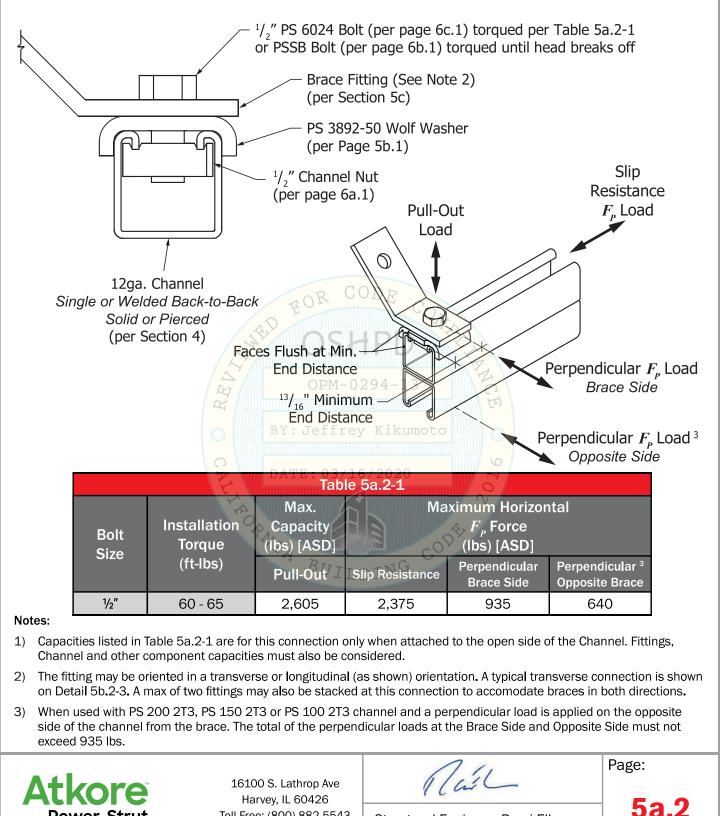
A.1-1: TYPICAL FITTING CONNECTION TO STRUT
